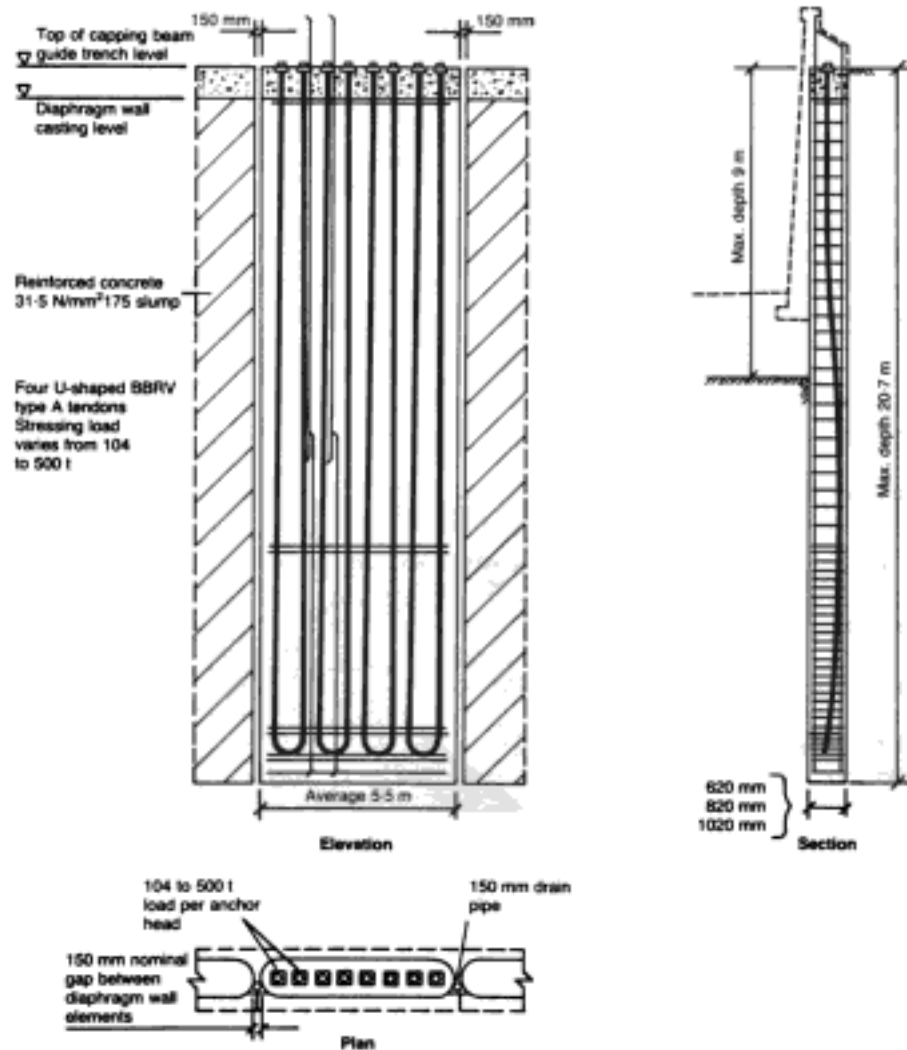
Typical diaphragm wall reinforcement cage with curved tendons, Irlam O' Heights near Manchester, UK (Fuchsberger and Gysi²¹)
